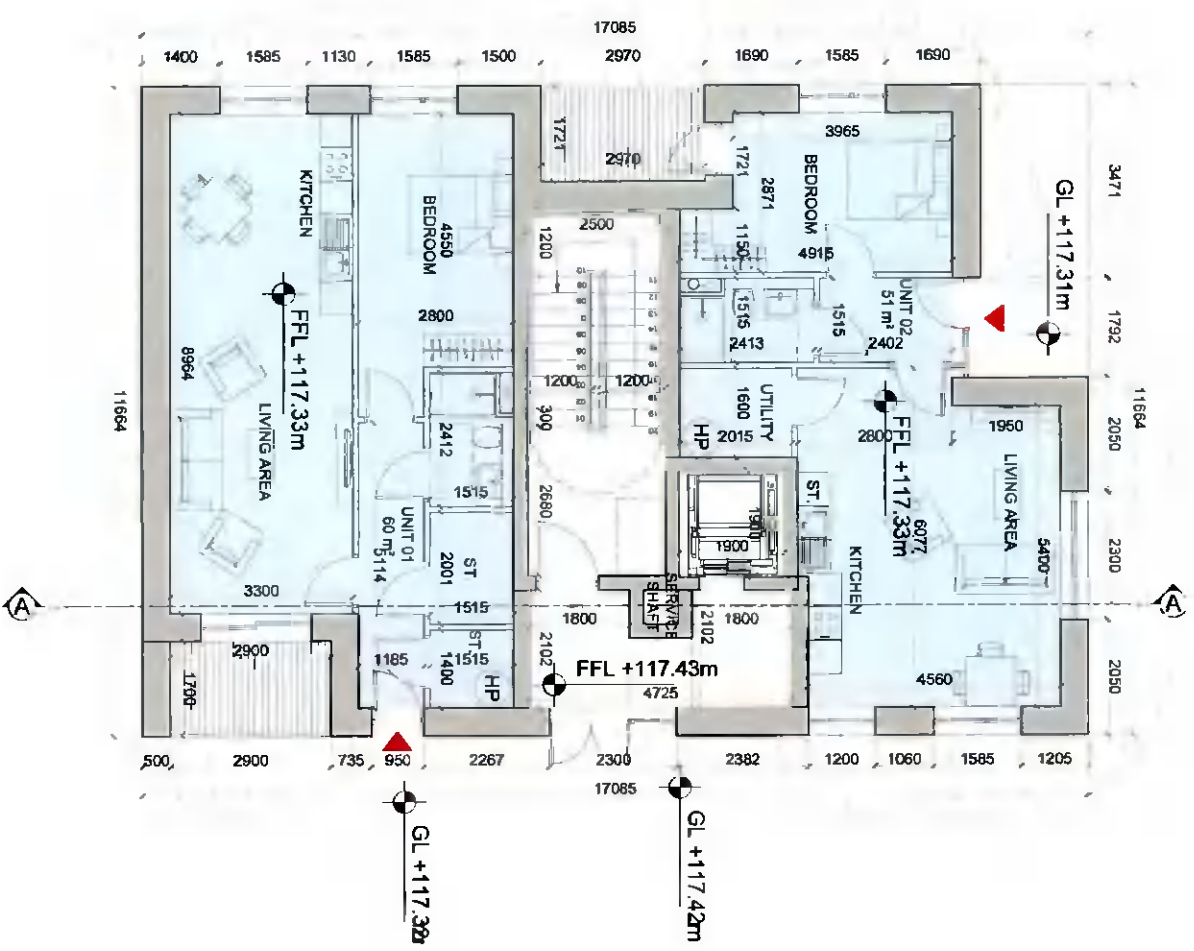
IMAGE : Block A - Apartments Ground Floor - Not to Scale
